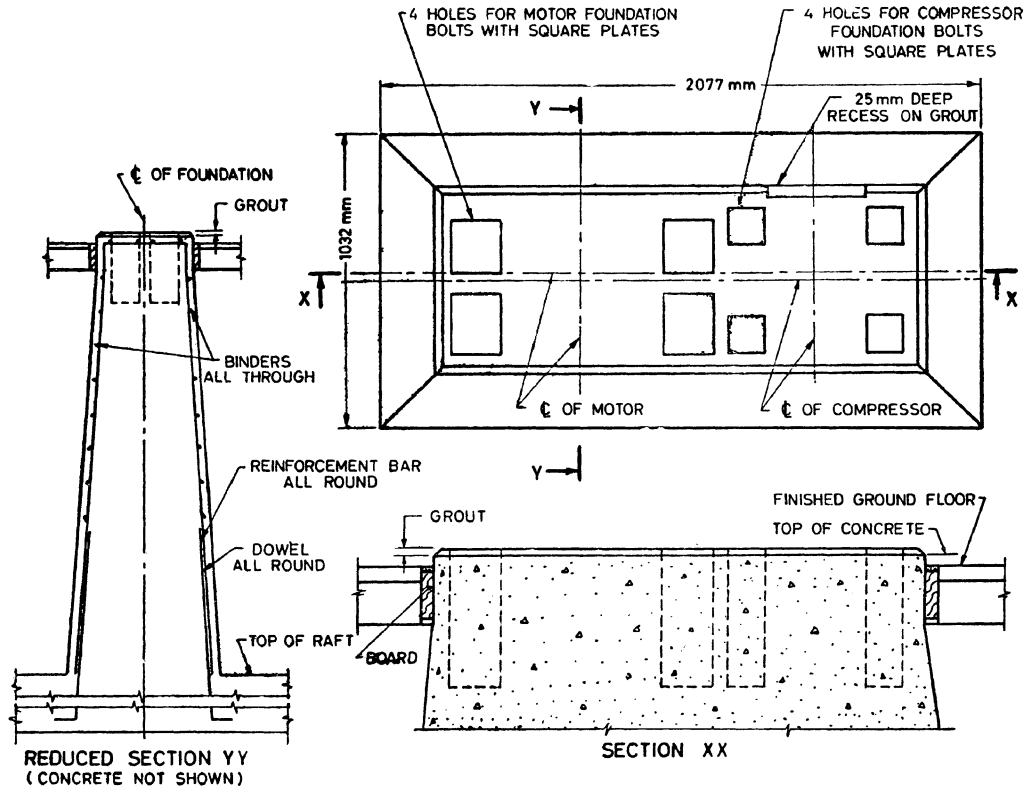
TYPICAL FOUNDATION FOR INSTRUMENT AIR COMPRESSOR
